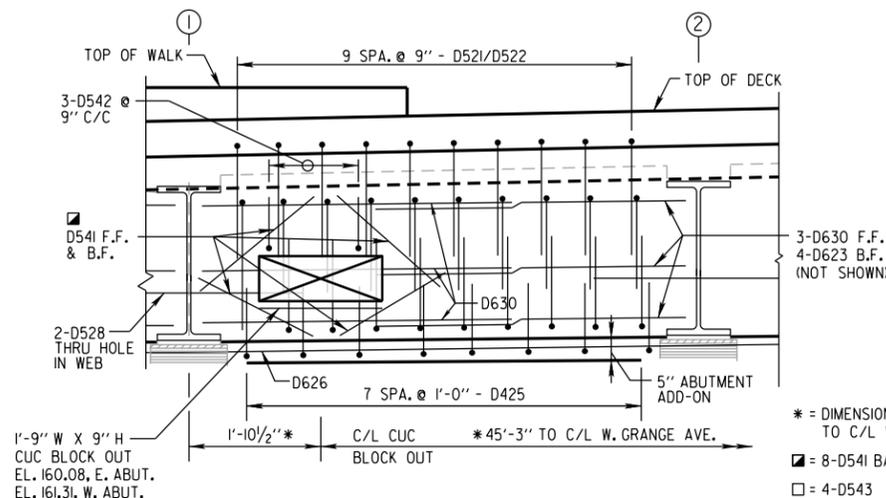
DETAIL OF AT&T BLOCK OUT OPENING AT EAST ABUTMENT DIAPHRAGM END
